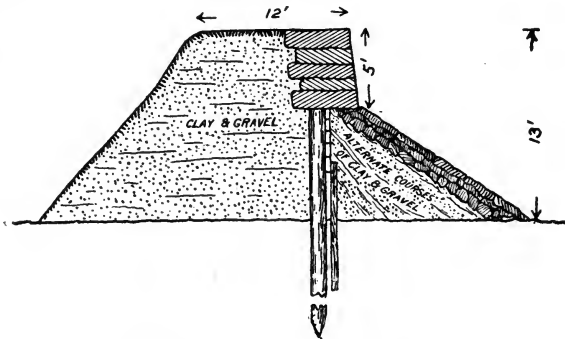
CROSS-SECTION OF LITTLE KUKUNA WEIR.
